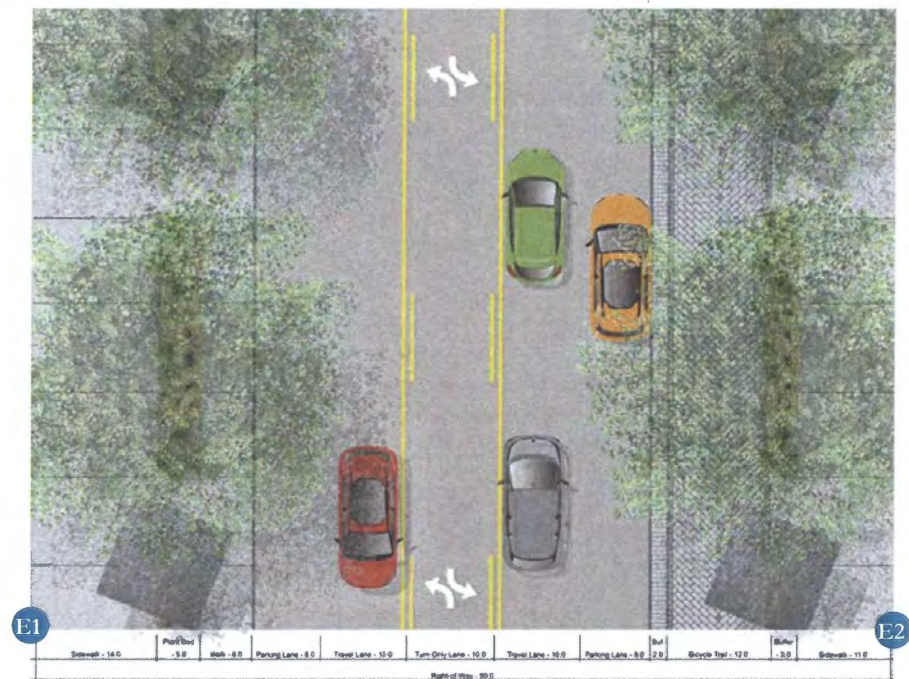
West 6th Street Between St. Clair Avenue and Johnson Court Zoomed-In Plan
